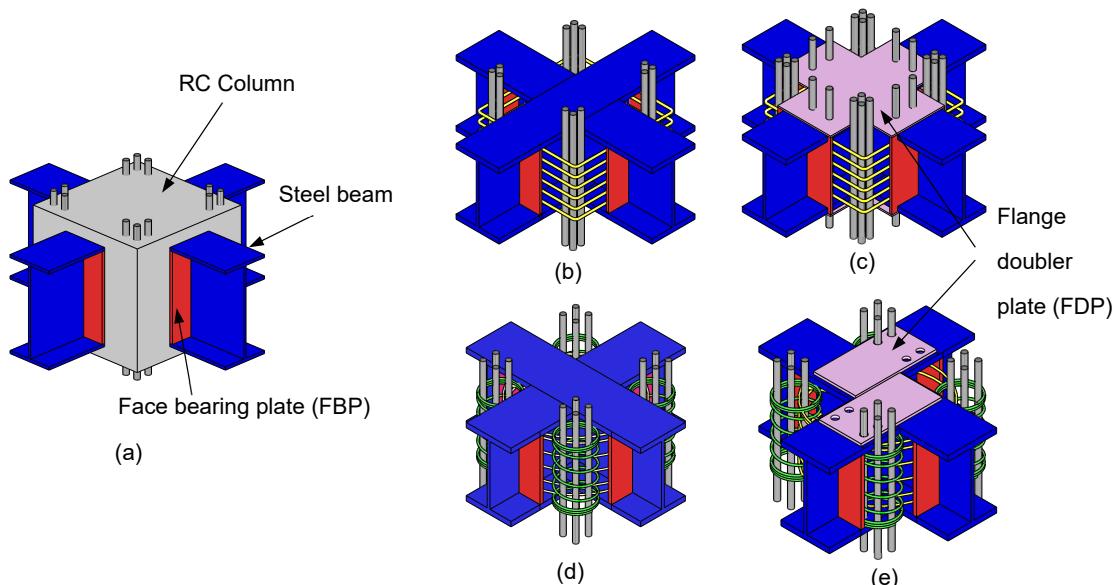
a) Conventional through-beam type RCS joint; b) Conventional joint with rectilinear ties; c) joint with realistic longitudinal reinforcement ratio; d) joint with five-spiral transverse reinforcement; e) eccentric joint.
